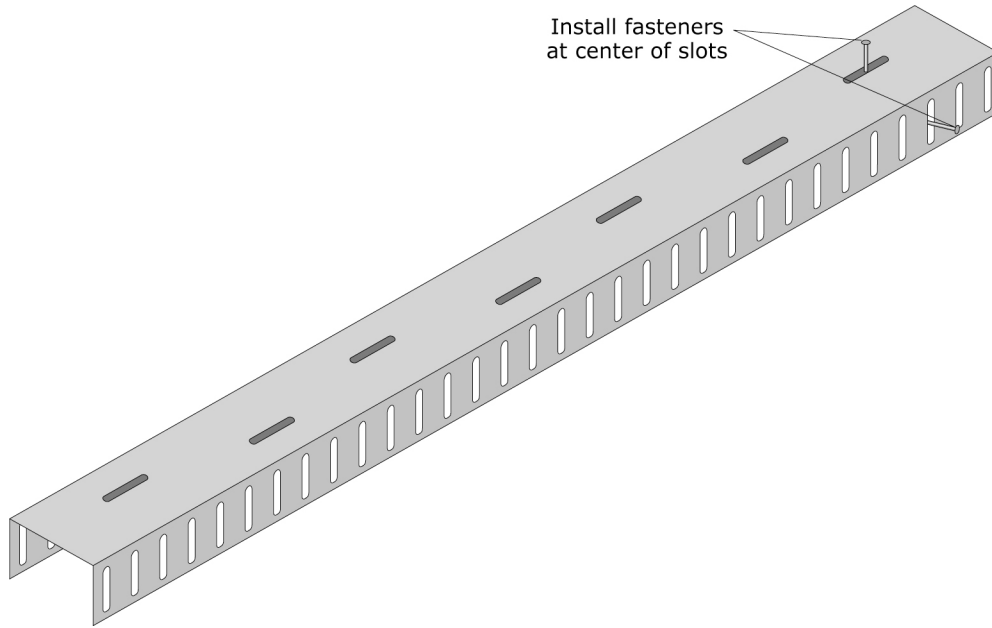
Example proprietary top track metal stud connection system. Studs are connected to the track through vertically slotted holes to allow for vertical movement. The connection of the track to the overhead structure through longitudinally slotted holes can accommodate in-plane slip to minimize damage from drift. The longitudinal slip capability can be inadvertently compromised by installing screw connections through the solid web, by overtightening screws through the slots, or by interruptions of the vertical alignment of the track at beams or changes in elevation of the overhead structure. This system does not solve the local damage at partition corners.
